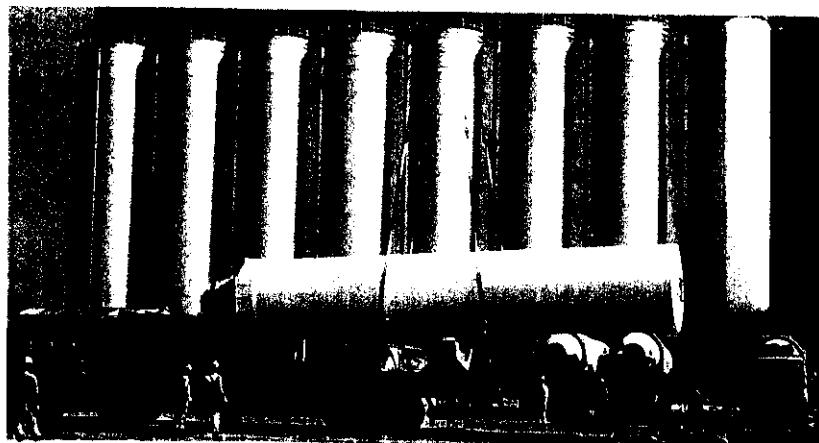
12-m length silo in construction field (made of the pipe shown in photo 4)
